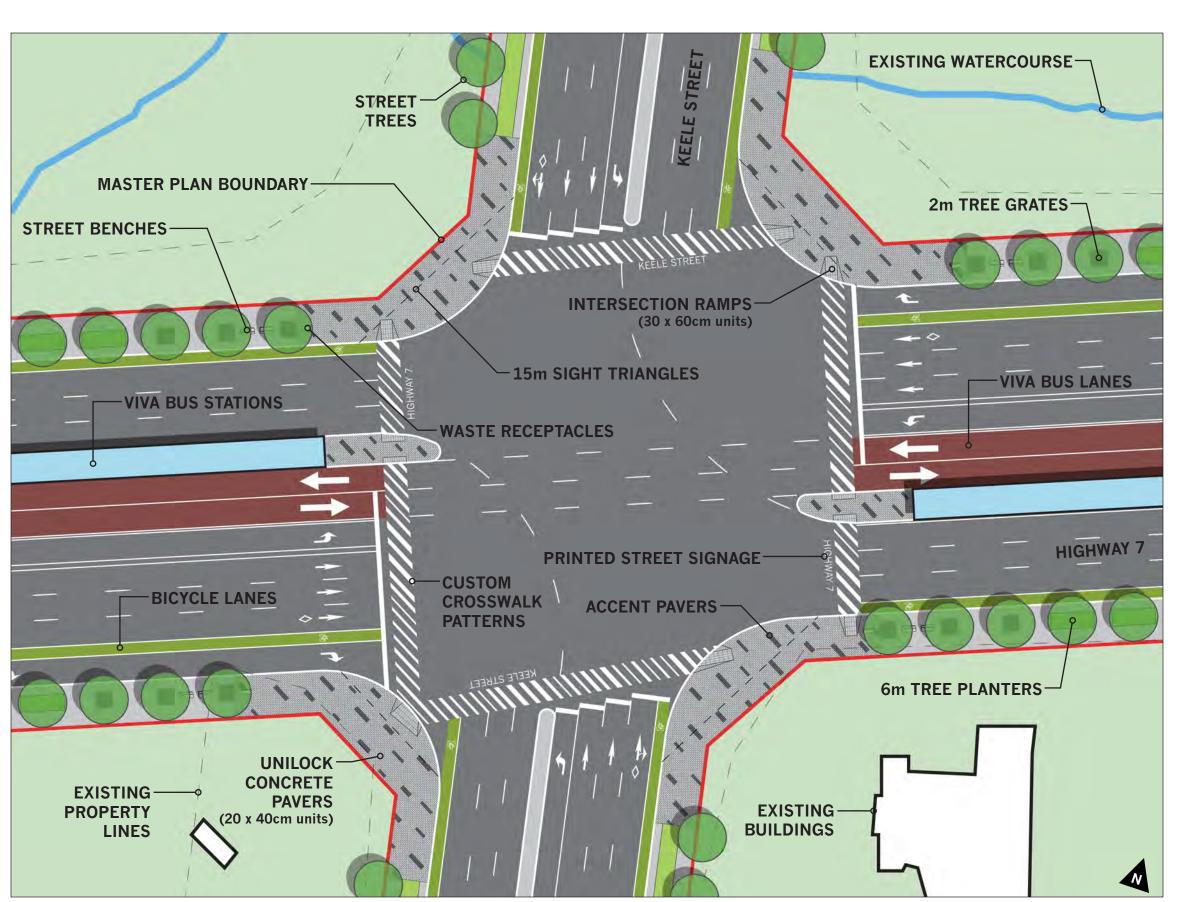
Highway 7 & Keele Street Intersection streetscape concept.
